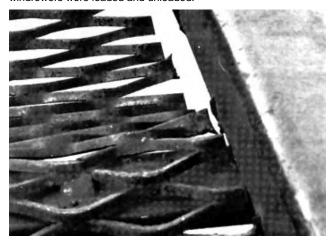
Failure of Welds on Loading Ramp Grating.
